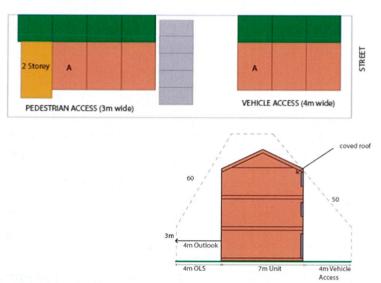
Example of modelled site layout using notified recession planes (plan and section)
